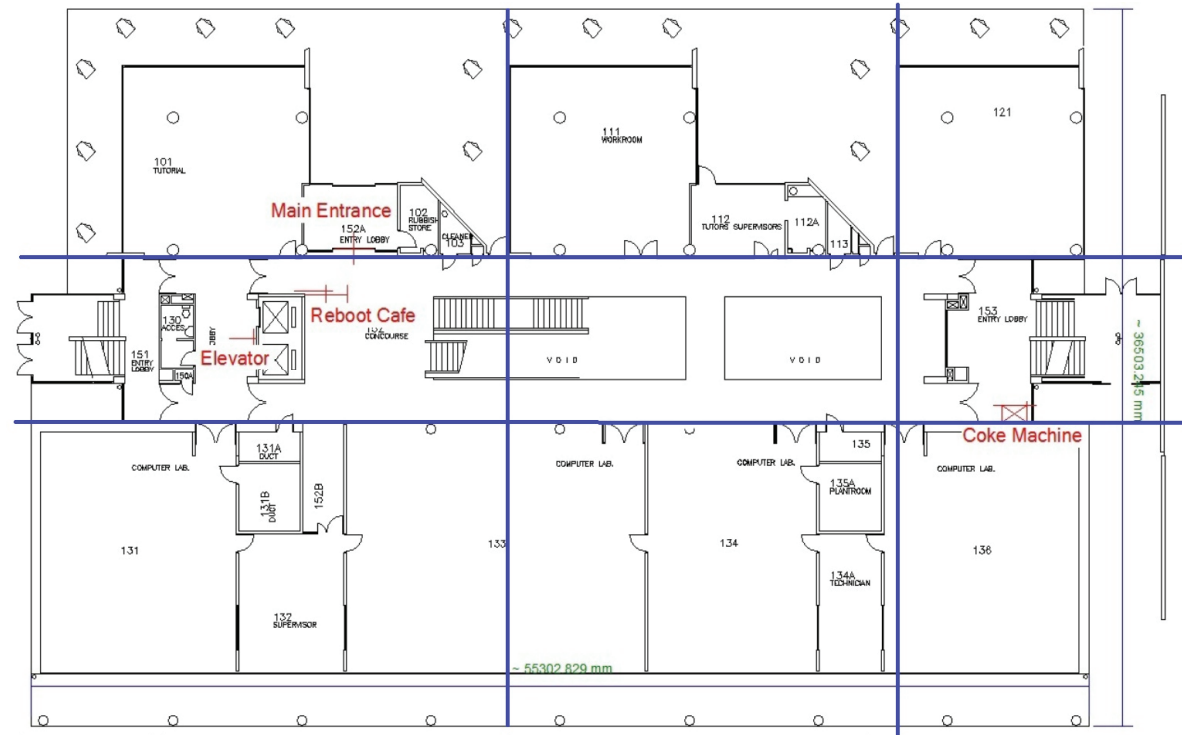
Floorplan of Erskine Building (first floor), all four targets are marked, scoring grid for floor plan task in bold lines across building.
